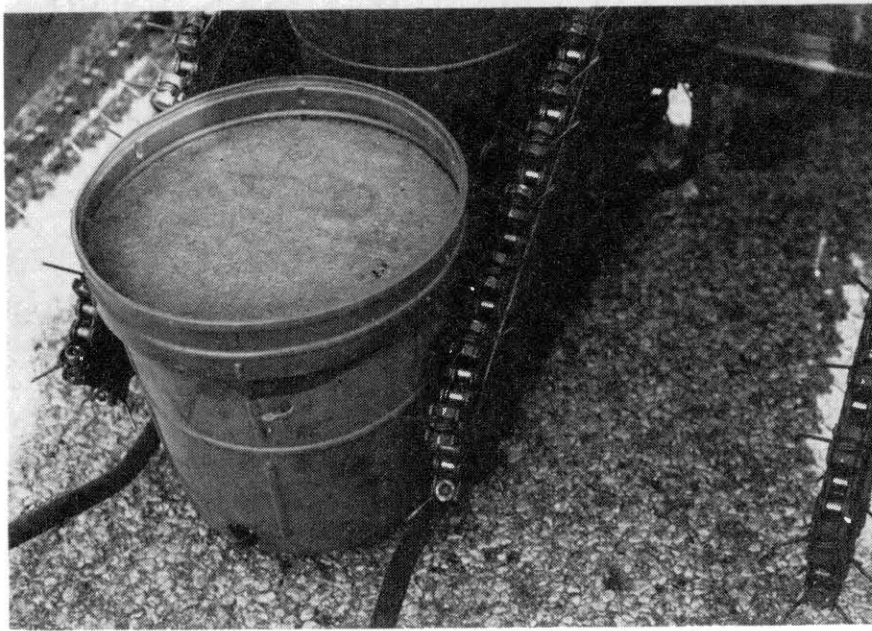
Closeup View of Front of Header Showing Guide Bars, Container and Chains During Placement
